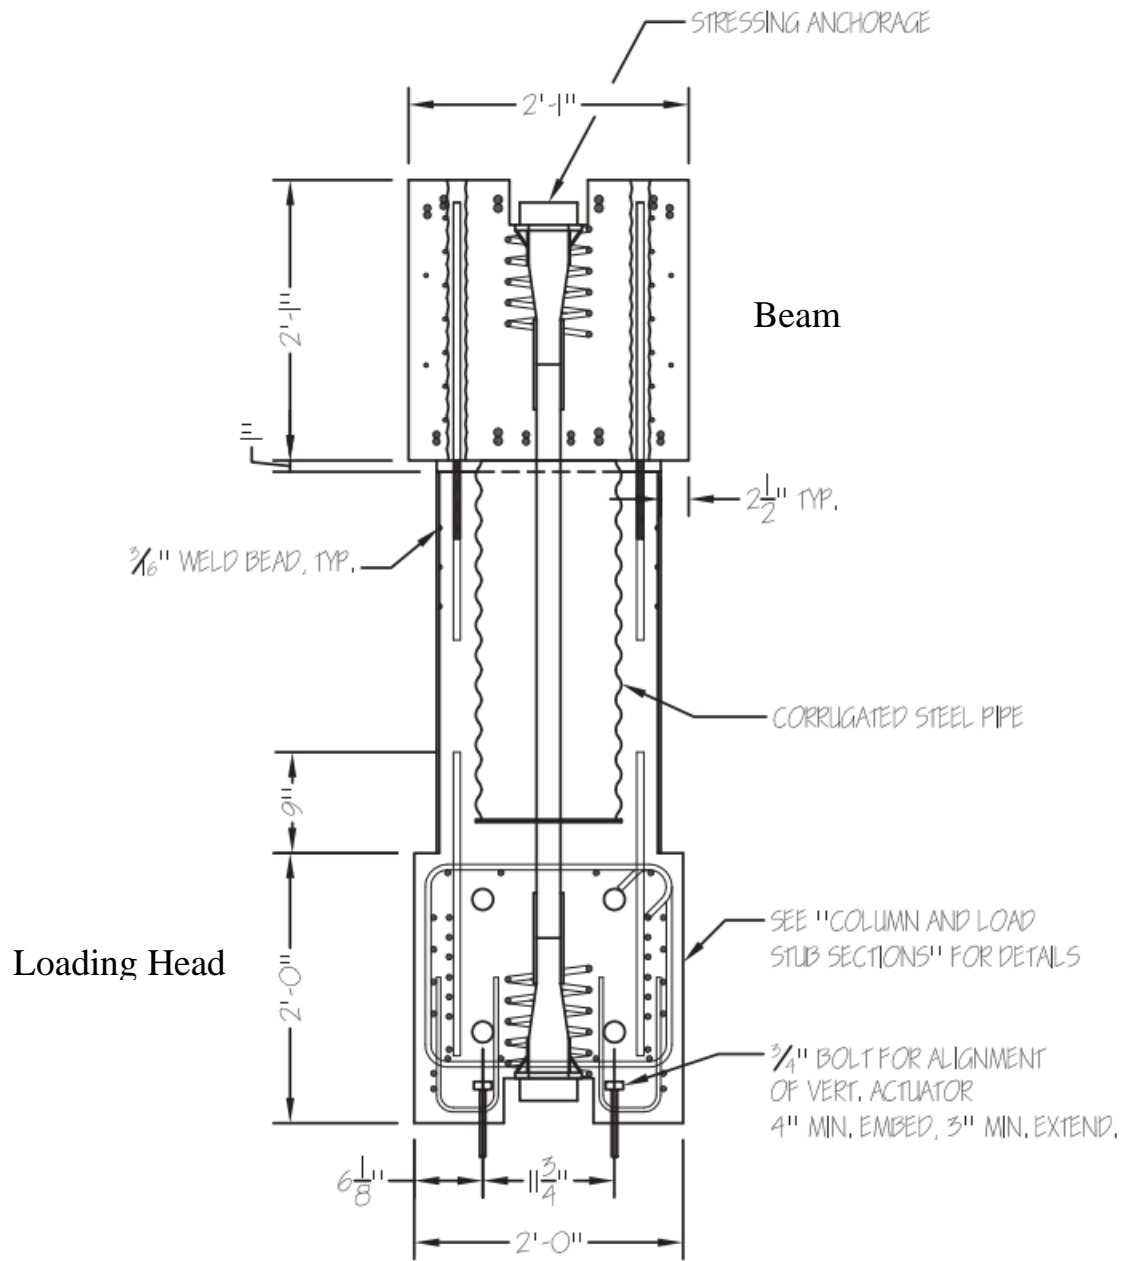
Elevation of “dual shell” column tested by Tobolski et al. 2010
